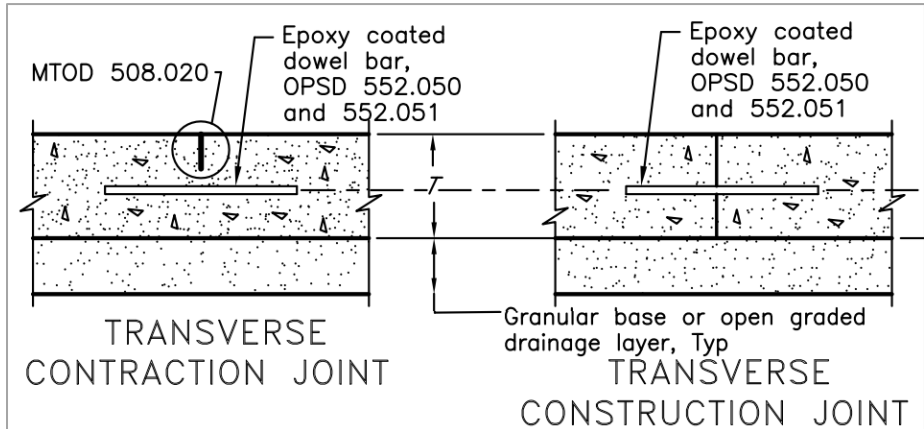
Excerpt for MTOD 552.010 Transverse Joint Requirements for Contraction and Construction Joints.
